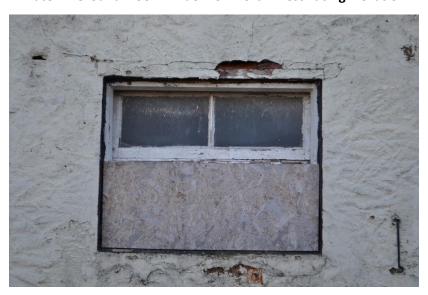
Ground Floor Window 2 on North West Facing Elevation
